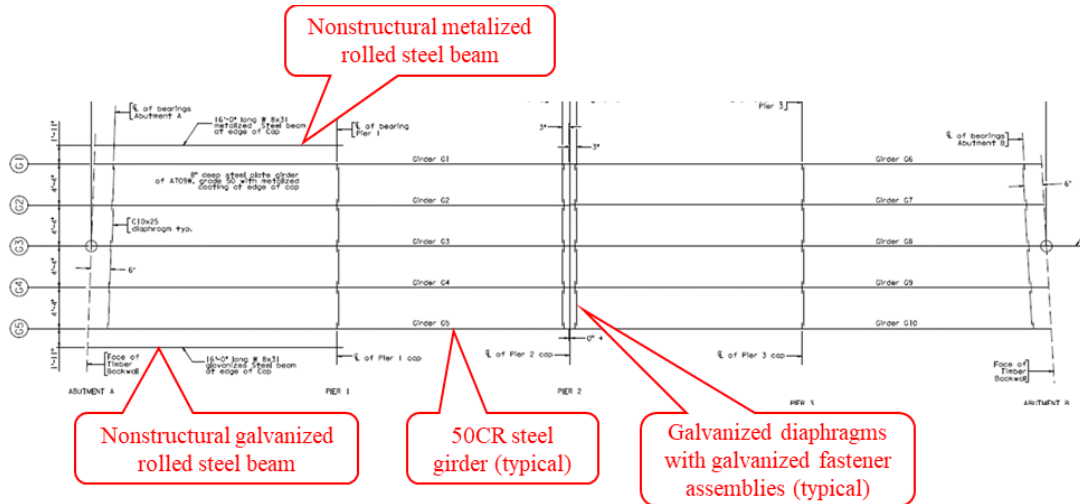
Framing Plan of the 2022 Holdens Creek Bridge
